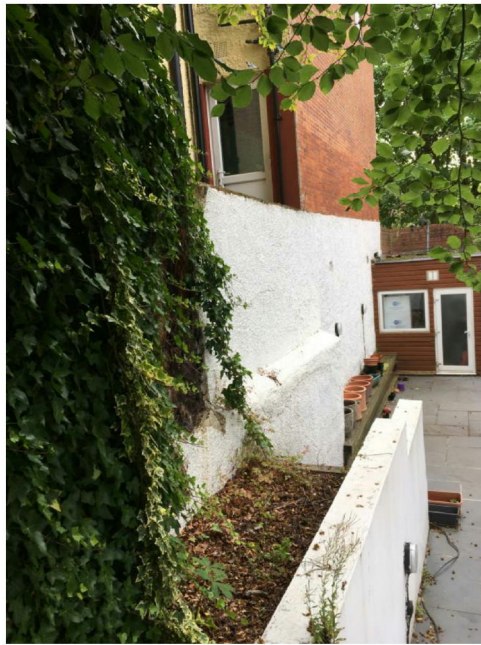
Photo taken from rear of No.30 facing south west showing party wall/stepped party fence wall and inset garden retaining wall
